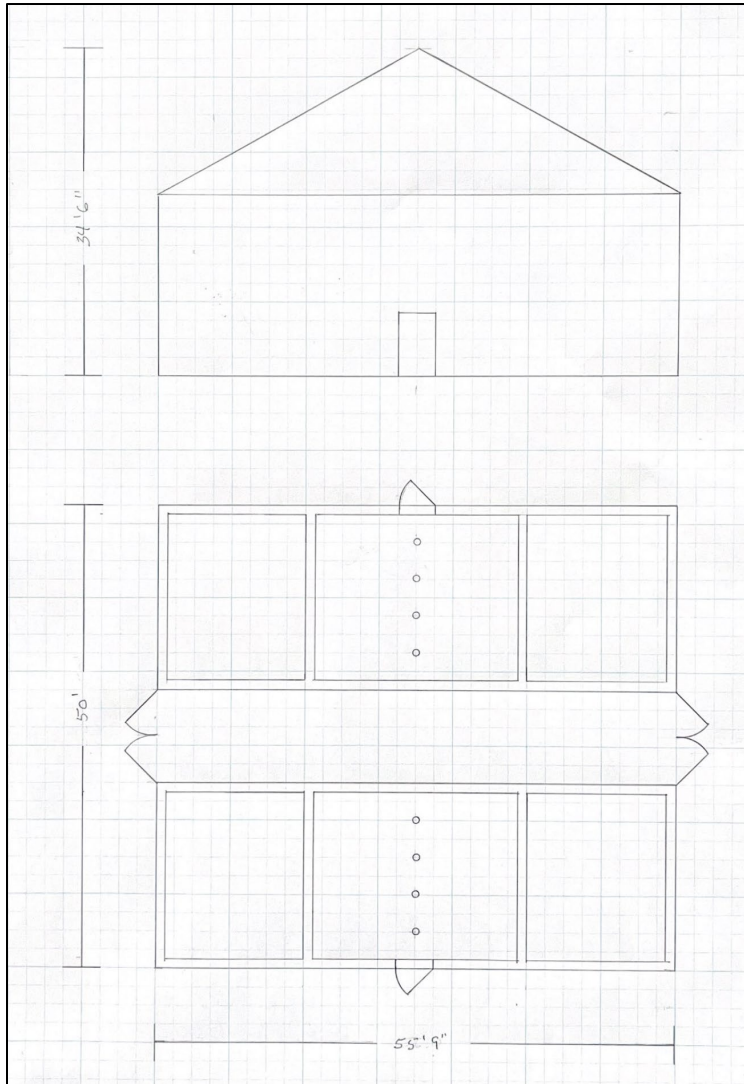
The design of the Chelsea tobacco barn (PG-17-018) negated the requirement for sheds, containing all of the hanging tiers within the truss roof frame (sketch plan and elevation).
